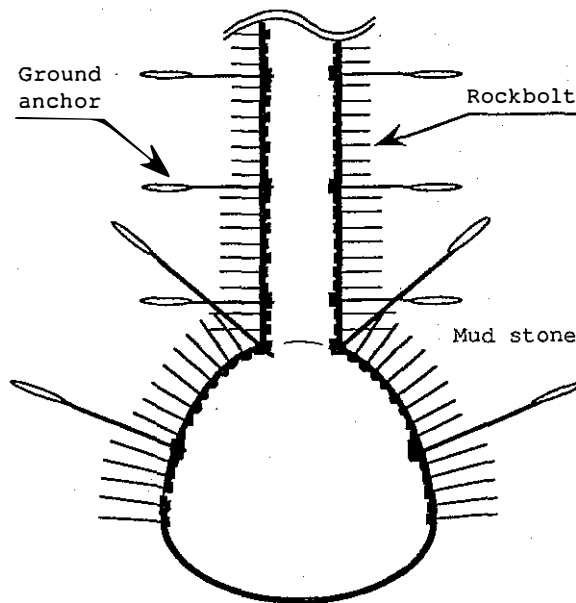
Proposed method to construct an underground space by employing rockbolts and ground anchors
